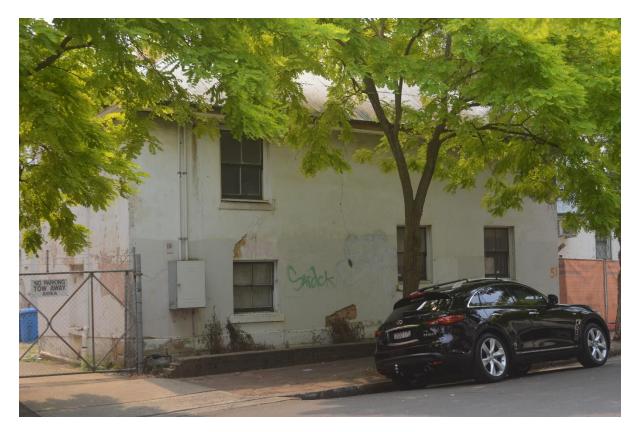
Rear of the site viewed from Buckingham Street, looking north-west
